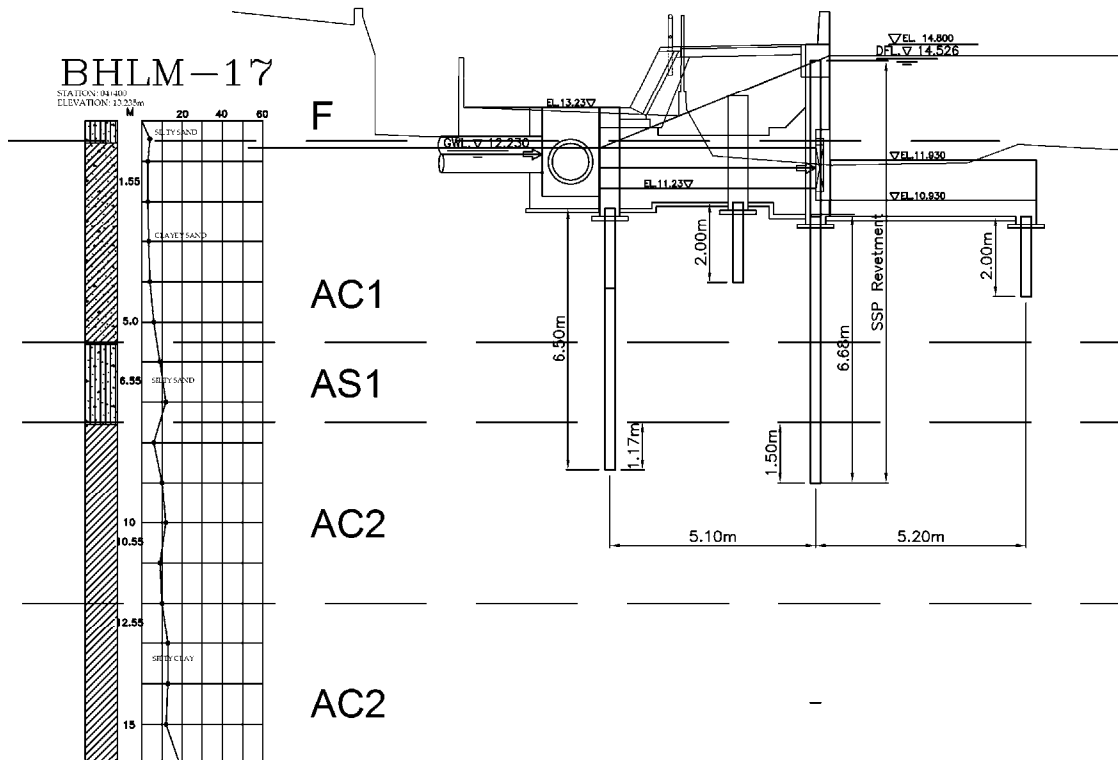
Length of SSP Cut off Wall (5/9) (MSL-5)
